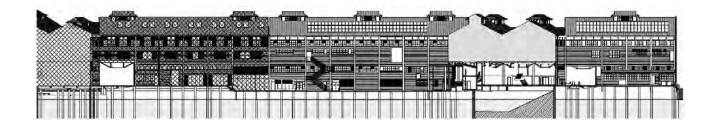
Existing and proposed Hickson Road south elevation through shore sheds (proposed alterations shown in blue)
